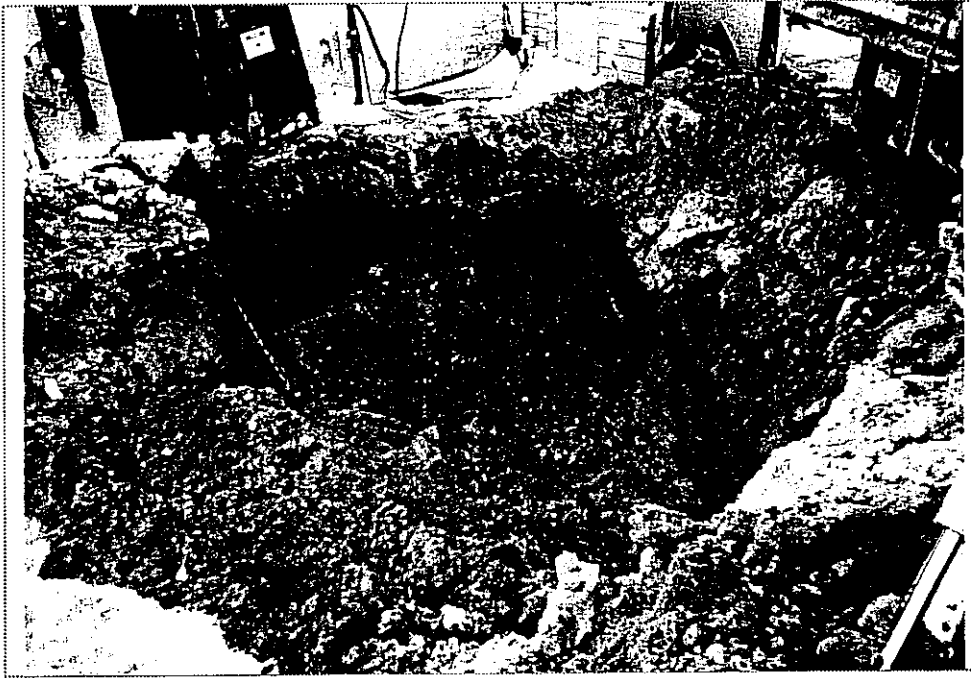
View of questionable material in sidewall of UST-9401 excavation (looking southeast).
